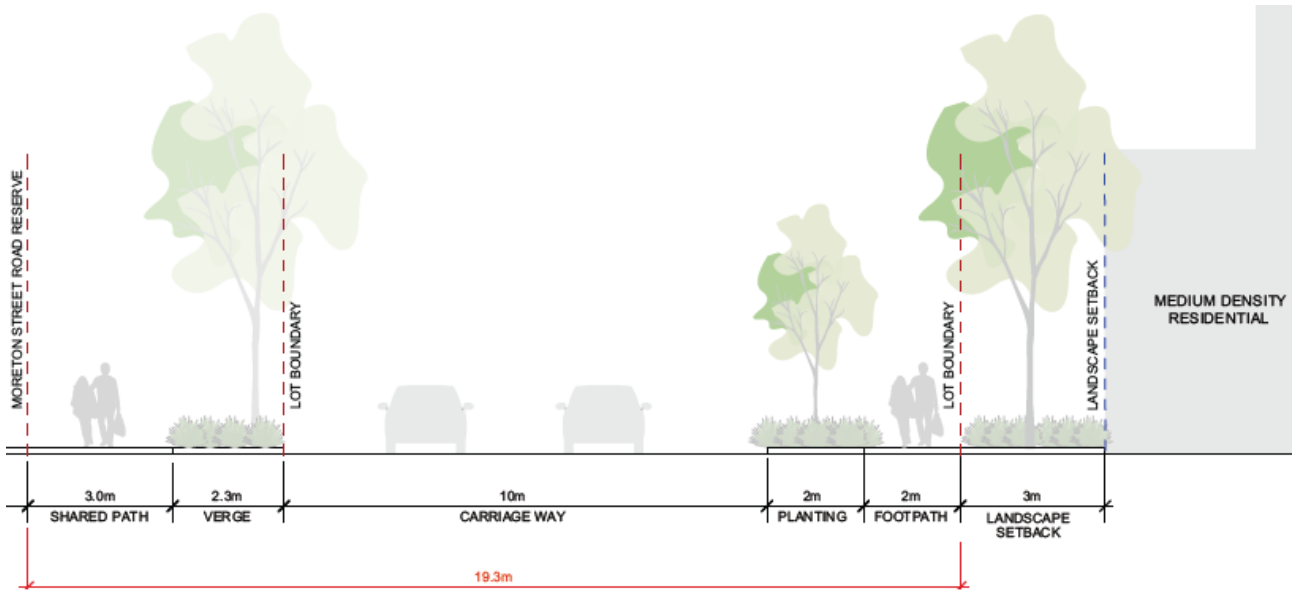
Moreton Street road corridor (Council PRCUTS Stage 2 Public Domain Plan)
